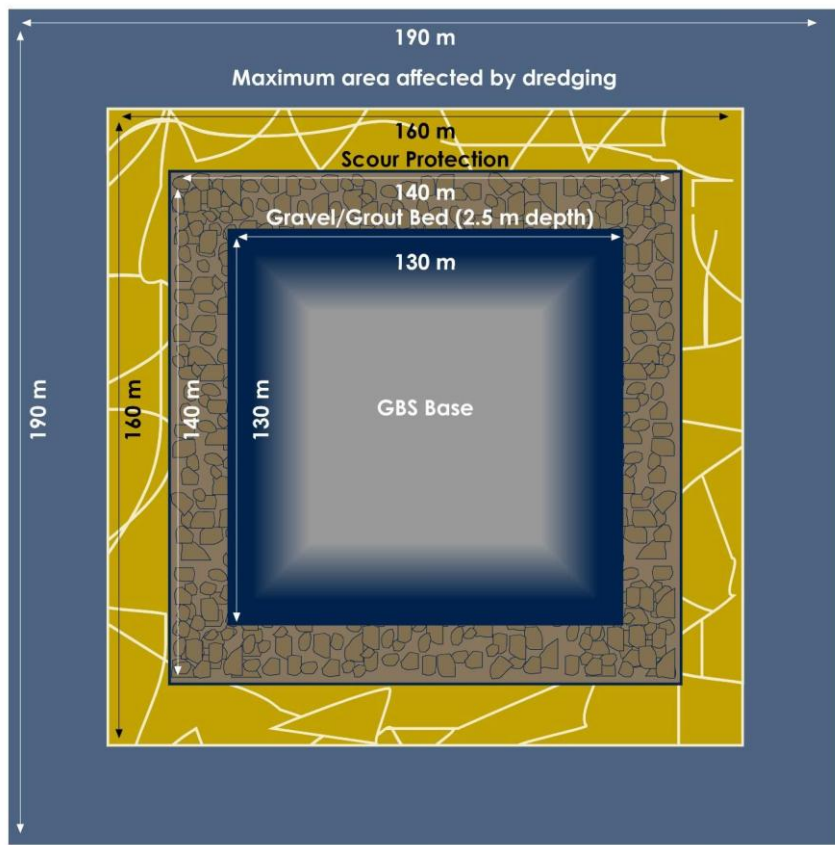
Plan View of the Seabed, Showing Area Affected by the Platform GBS Substructure and Gravel Bed Foundations*.
